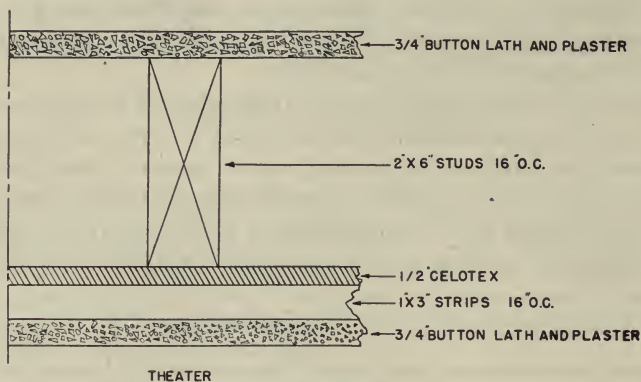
Detail of walls between theaters and hallways and exterior walls.
